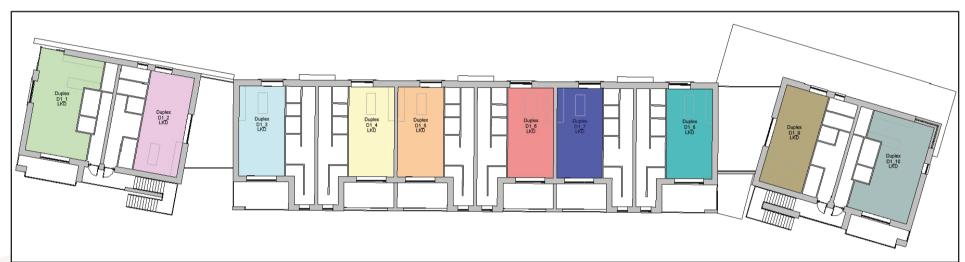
Floor plan of assessed building with keyplan highlighting the assessed building.
